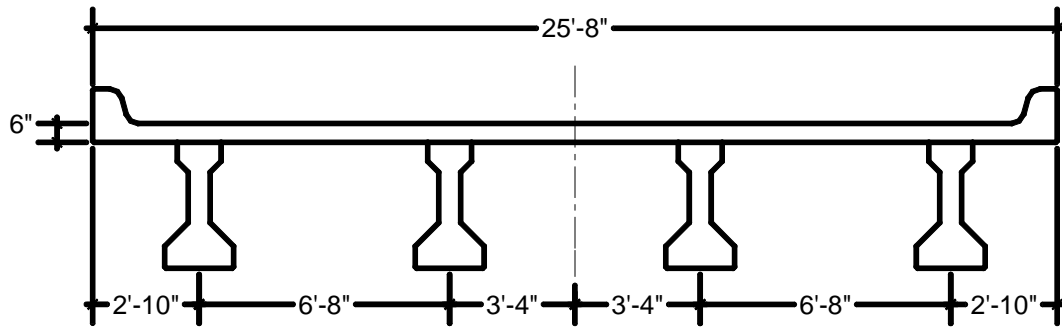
Chandler Creek Bridge Cross Section – 60' Span
